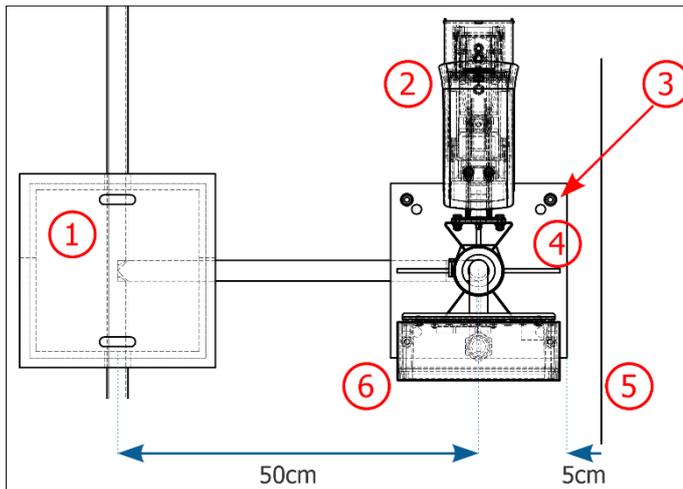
Panoramic or Rear capture post positioning: 1) Inspection box with cast iron cover, 2) ITSCAM VIGIA+ fixed to the post, 3) Parabolt type anchor bolts, 4) Post base, 5) Existing sidewalk curb, 6) Terminal box fixed to the post
